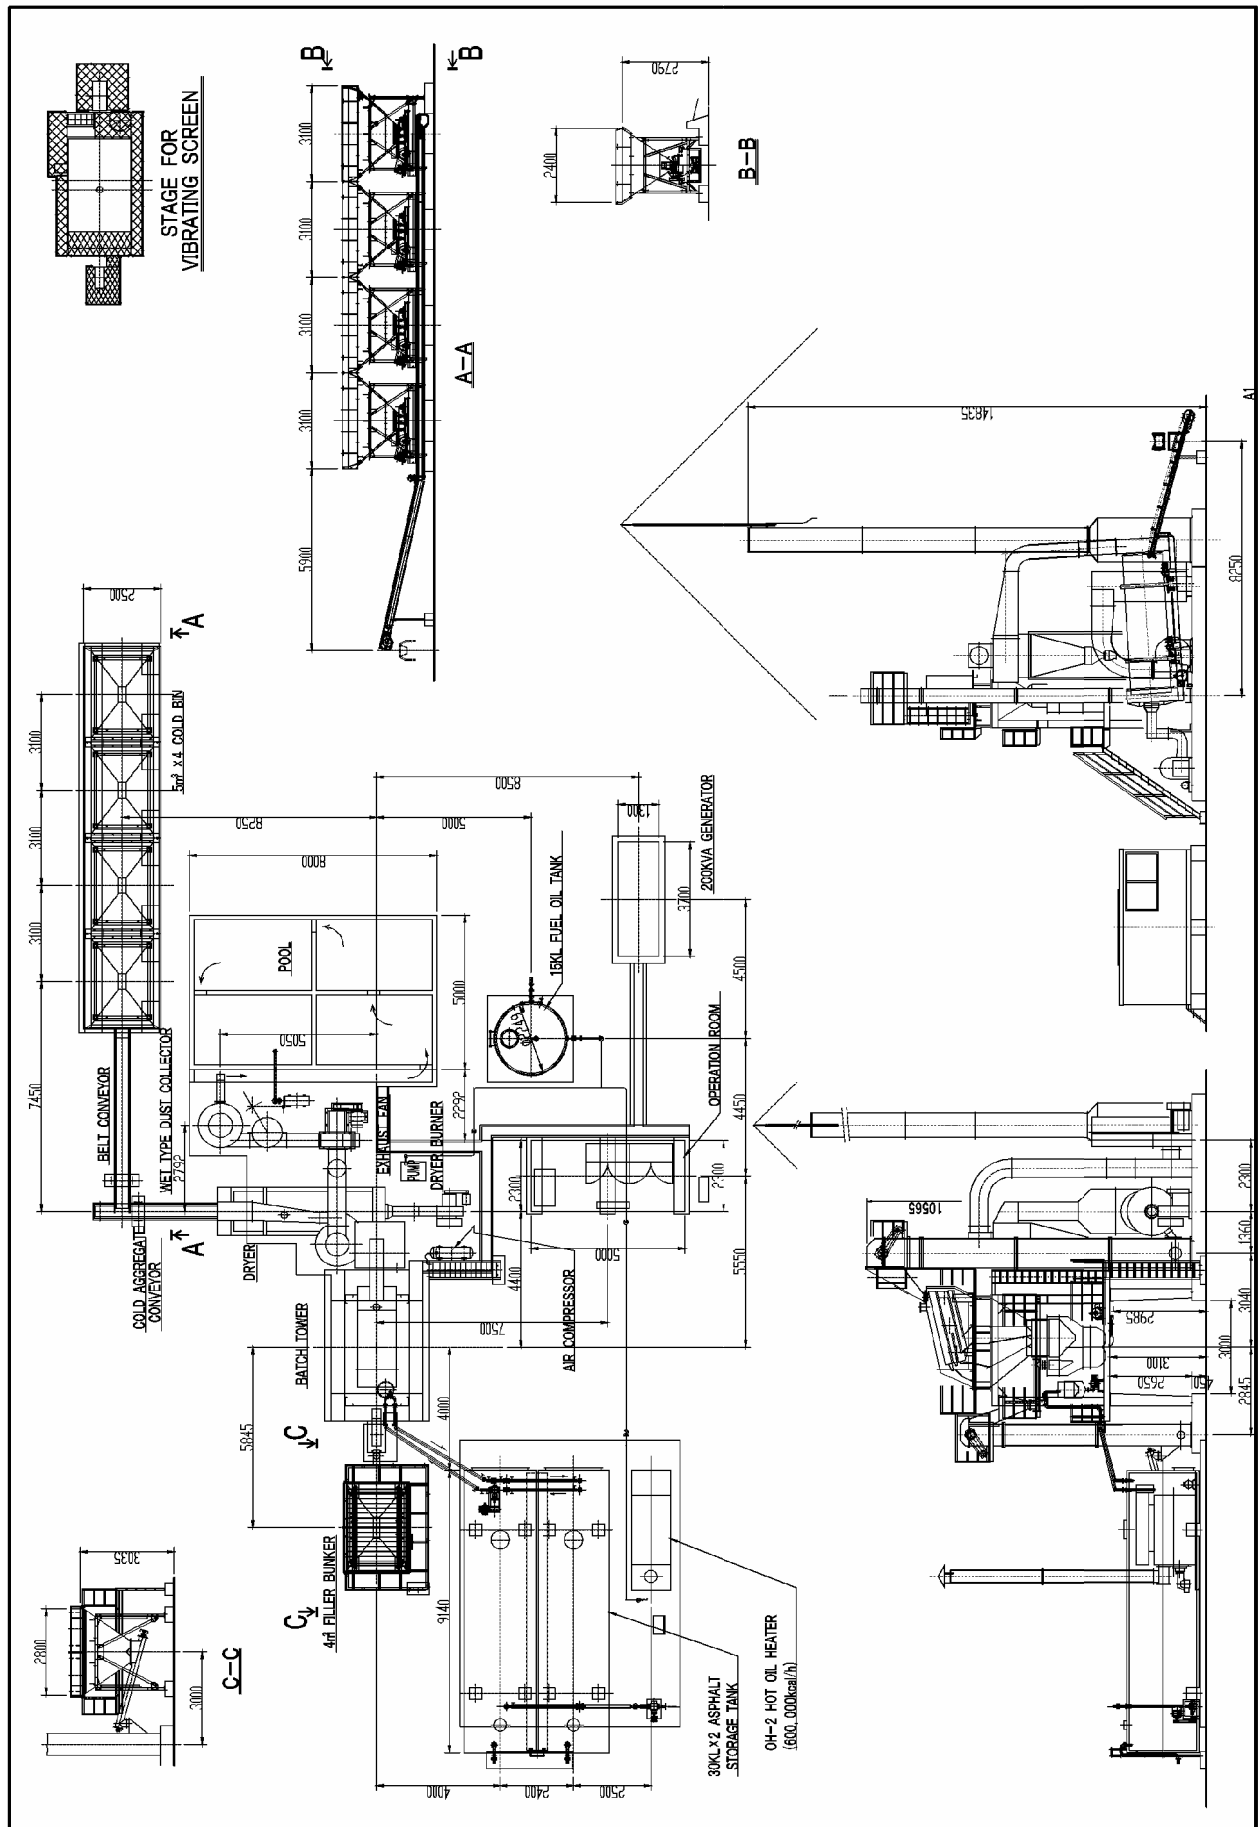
Layout Plan of Asphalt Plant
